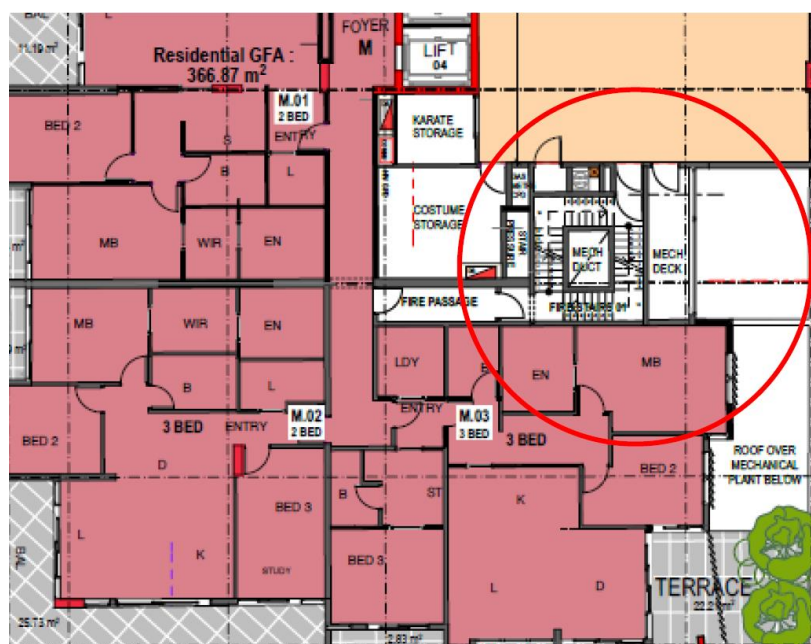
Extract of ground floor showing mechanical deck reflected on each residential level.
